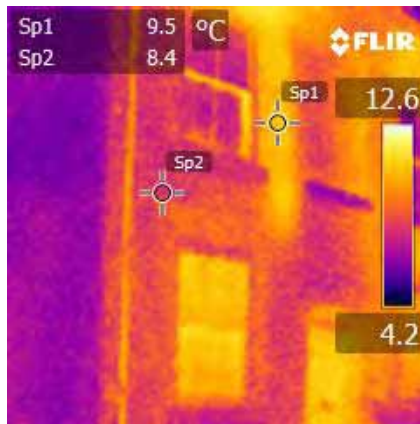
116 Abbeyforegate, Shrewsbury – Front elevation at first floor level.
